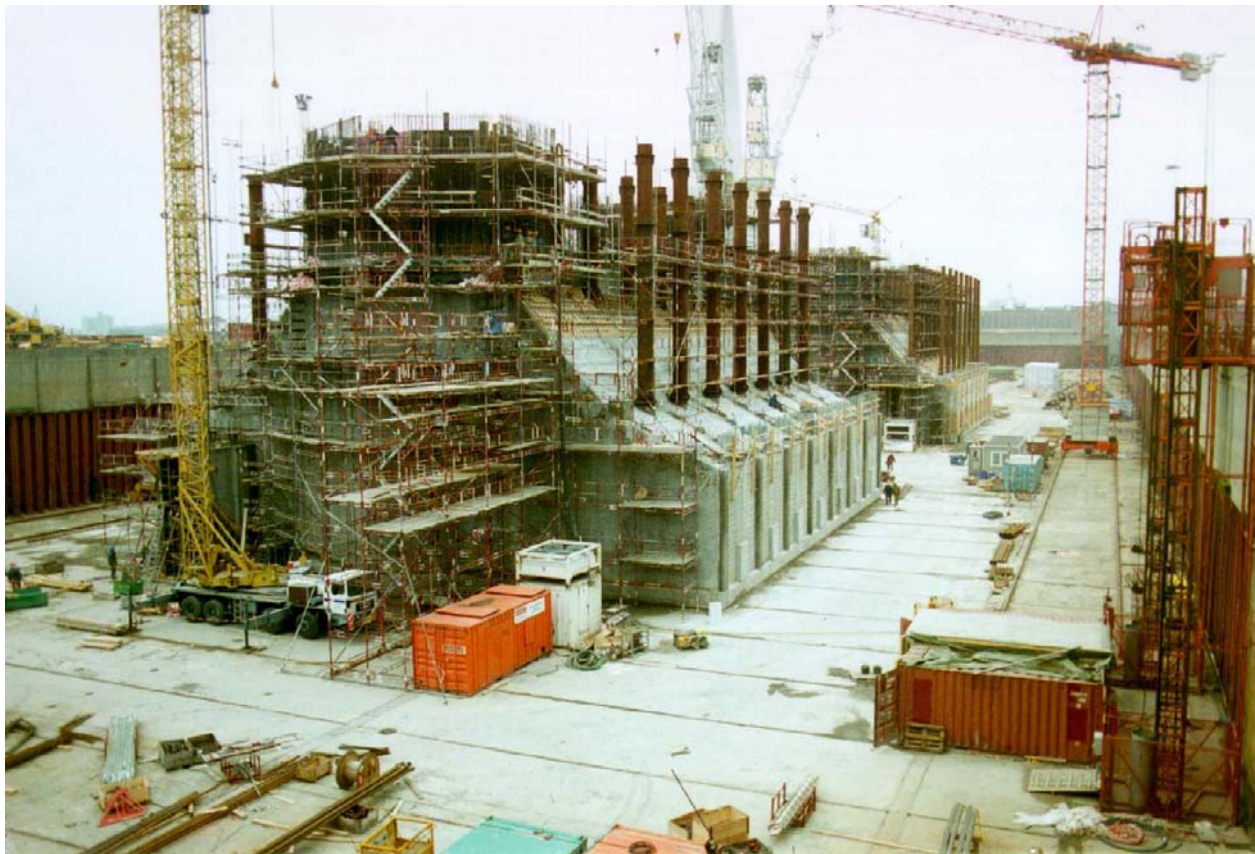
Prefabrication of concrete bridge pier caissons for the Oresund Crossing
